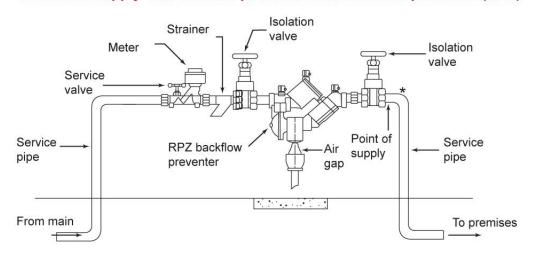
Examples of fitting details showing point of supply 7e Common fire and metered service connection
